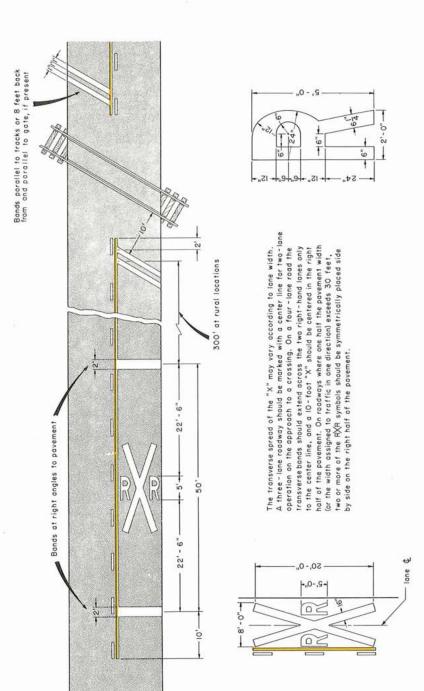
Standard pavement markings at railroad-highway grade crossings.
